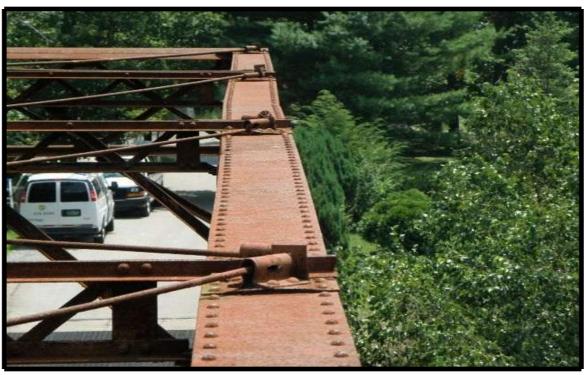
UPPER CHORD OF DOWNSTREAM TRUSS SPAN TWO BENT ON THE EXTERIOR CAUSING A UPSTREAM SWEEP BETWEEN U2 & U3
